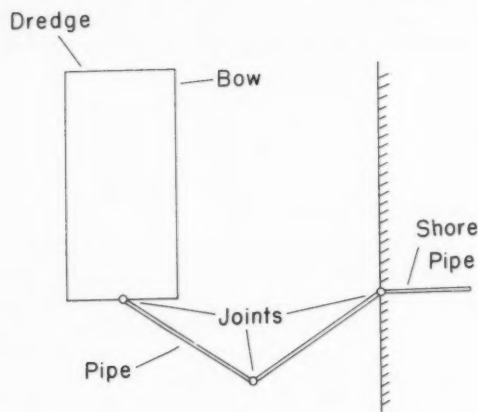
THREE JOINT PIPE CONNECTING METHOD
